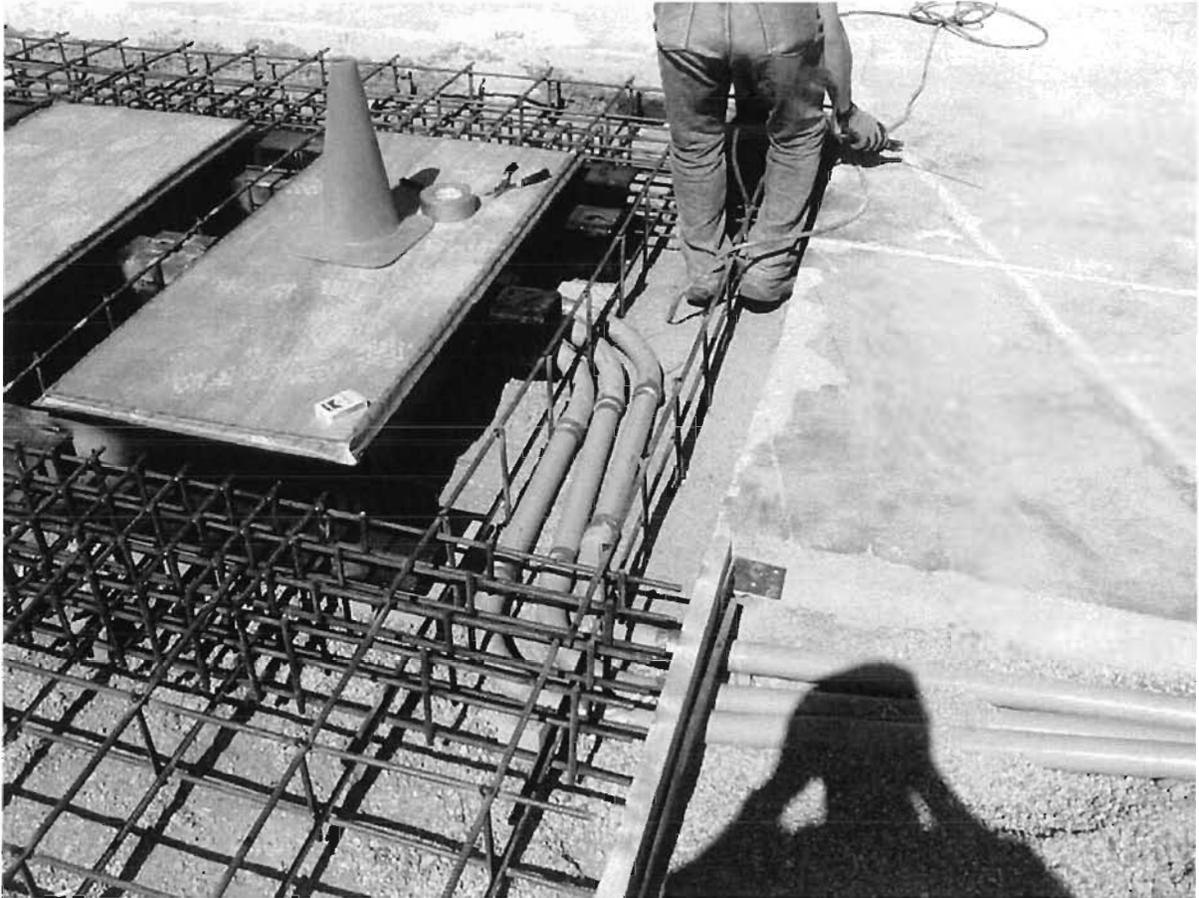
Three PVC conduits have been installed for the hydraulic hose interconnect. Two of these will run straight through the first Barrier on the way to the second and third Barriers. These ducts should be run in the most direct route possible to the hydraulic power unit.
